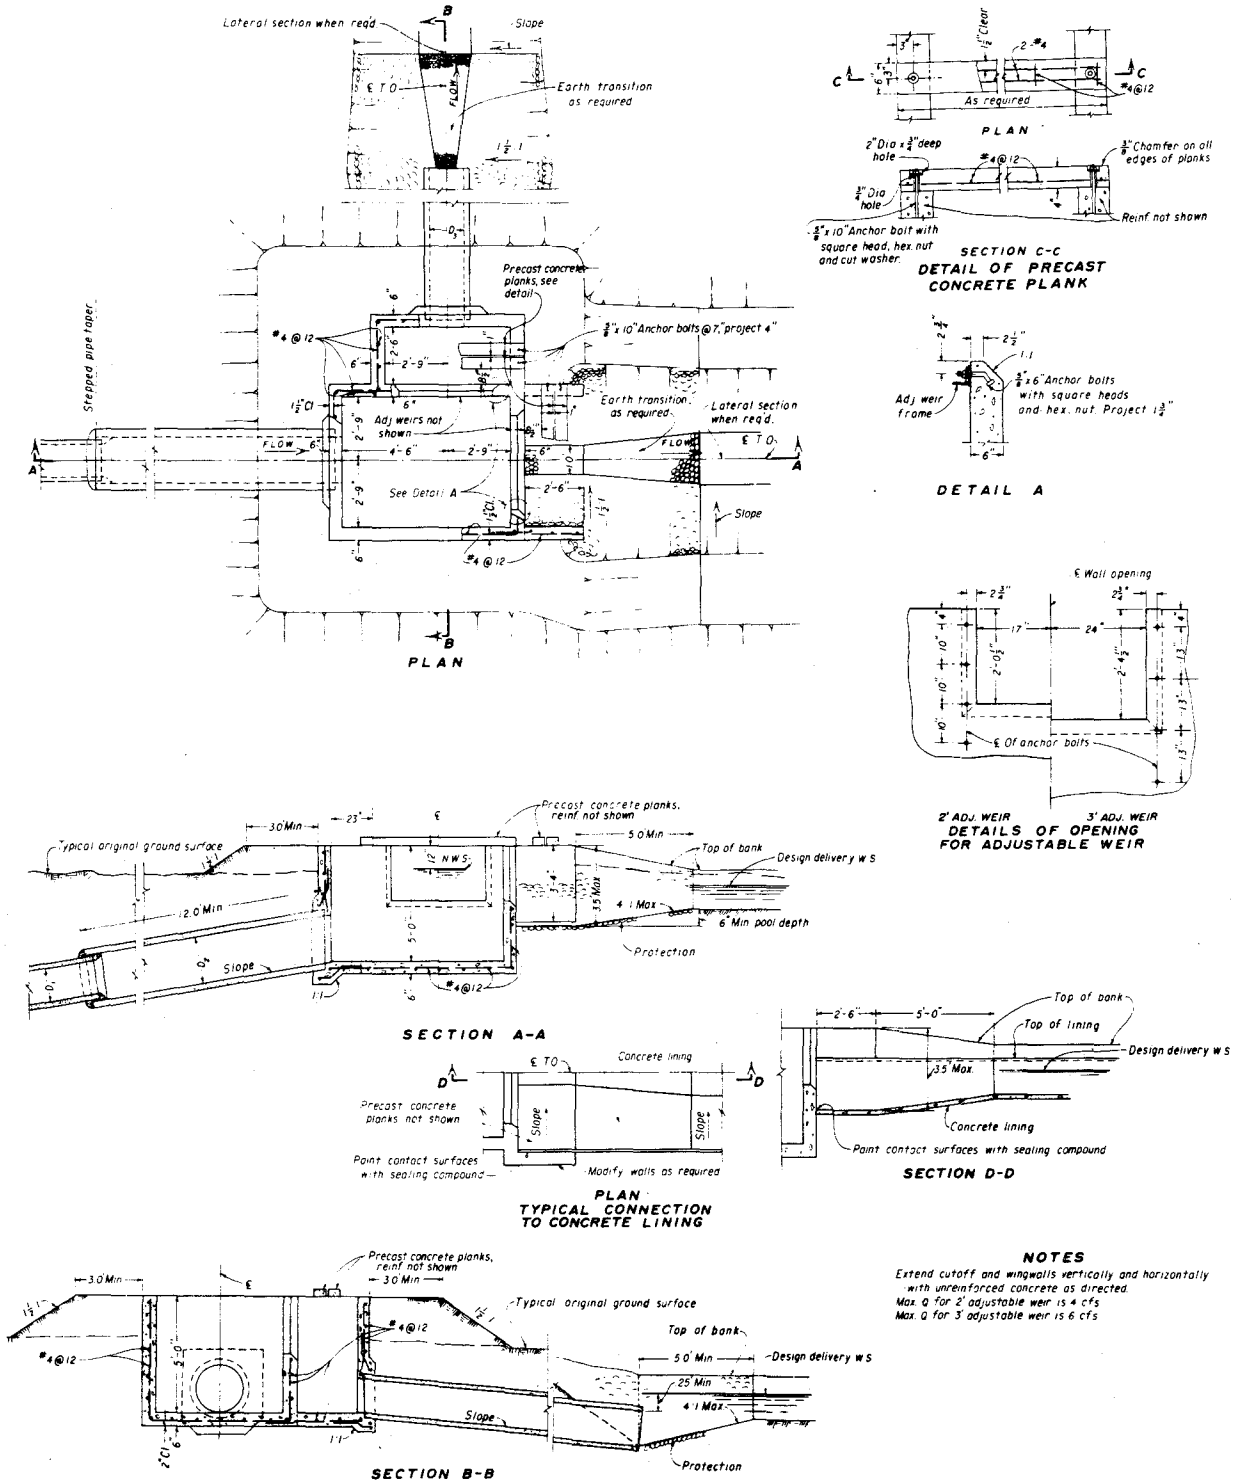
Division structure used as outlet to turnout. P 328-701-7166
